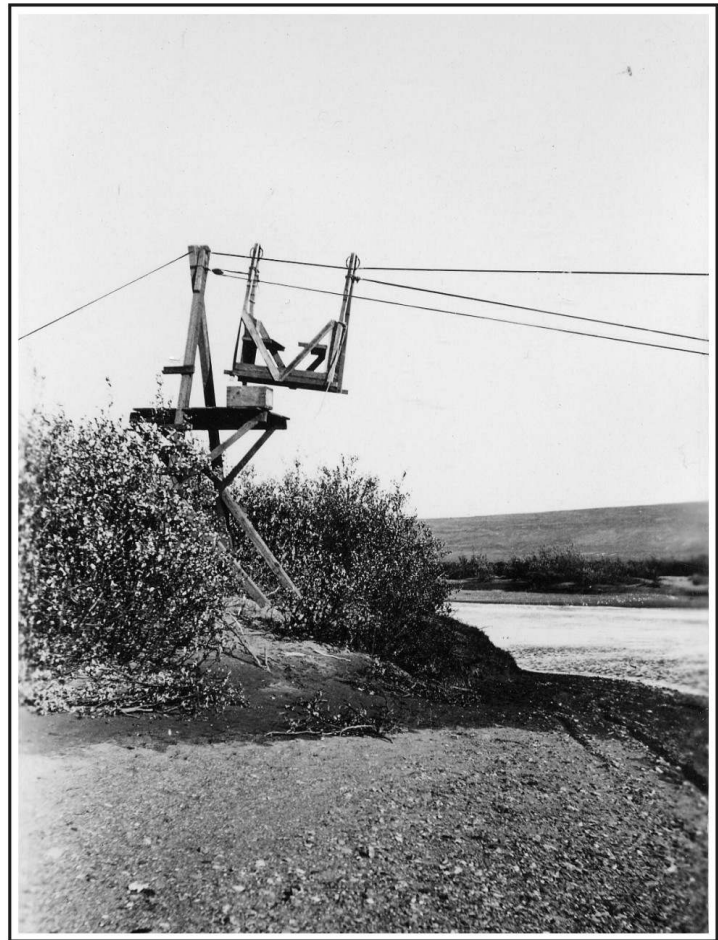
Standard cable tram installed by the ARC on river crossings along trails such as the Caro-Coldfoot Trail. Photo courtesy of the ADOT&PF Bridge Design Section, Juneau.
